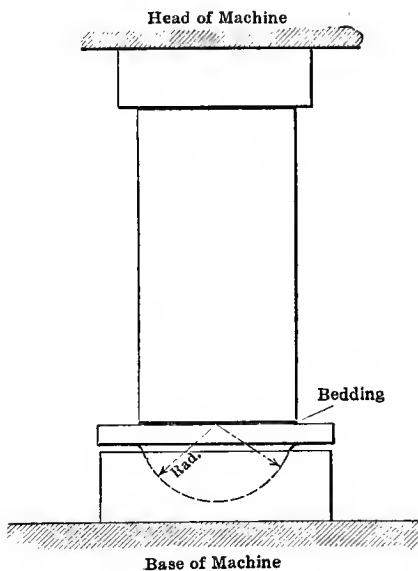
Spherical bearing plate and method of supporting test piece in compression.
